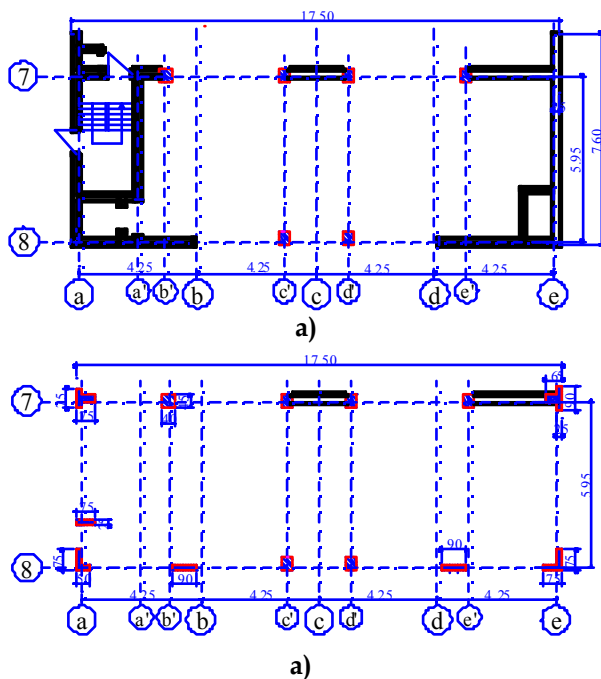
Floor plan of the structure: a) initial plan; b) plan after transforming bearing-walls in pseudo-columns
